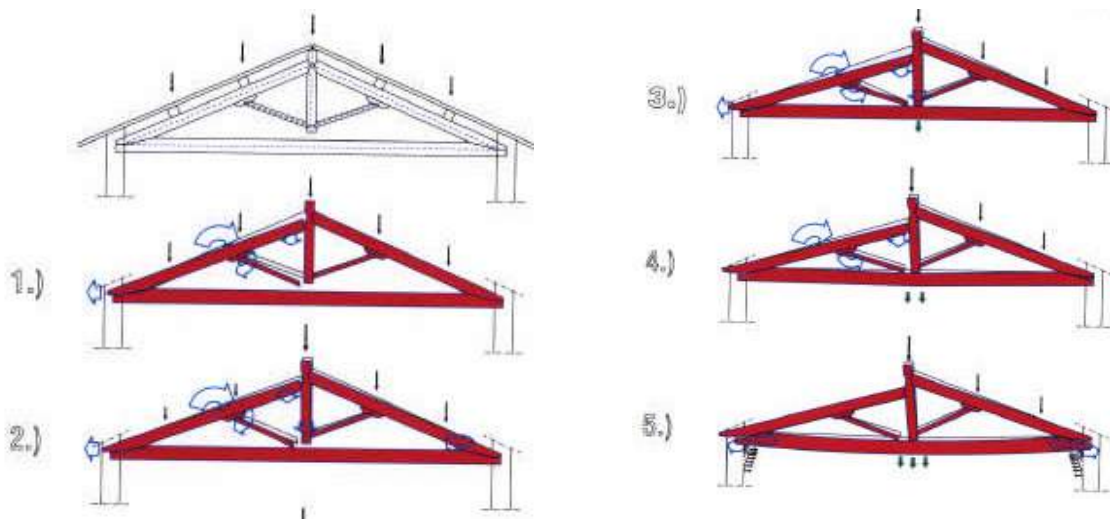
Schematic progressive failure of king post truss due faulty connection between rafter and tie beam.
